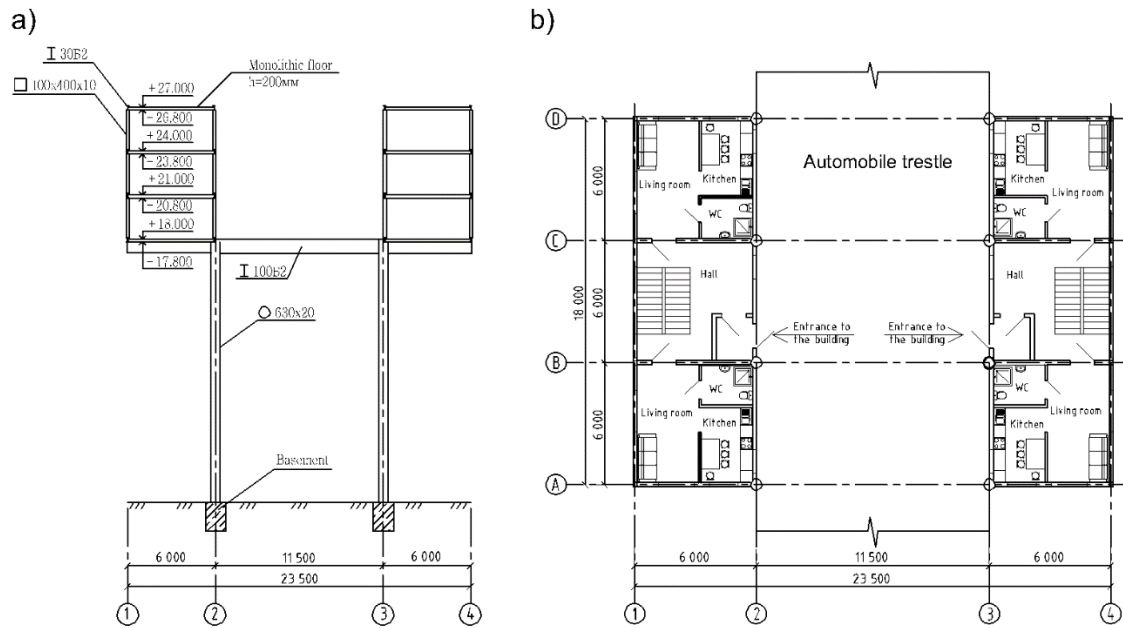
Schematic cross-section (a) and ground floor plan (b)
